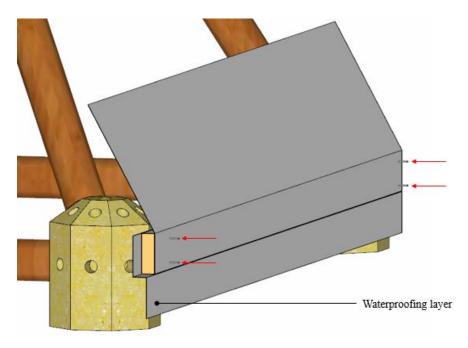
3D sketch showing the nailing of the roof beam to the roof structure
